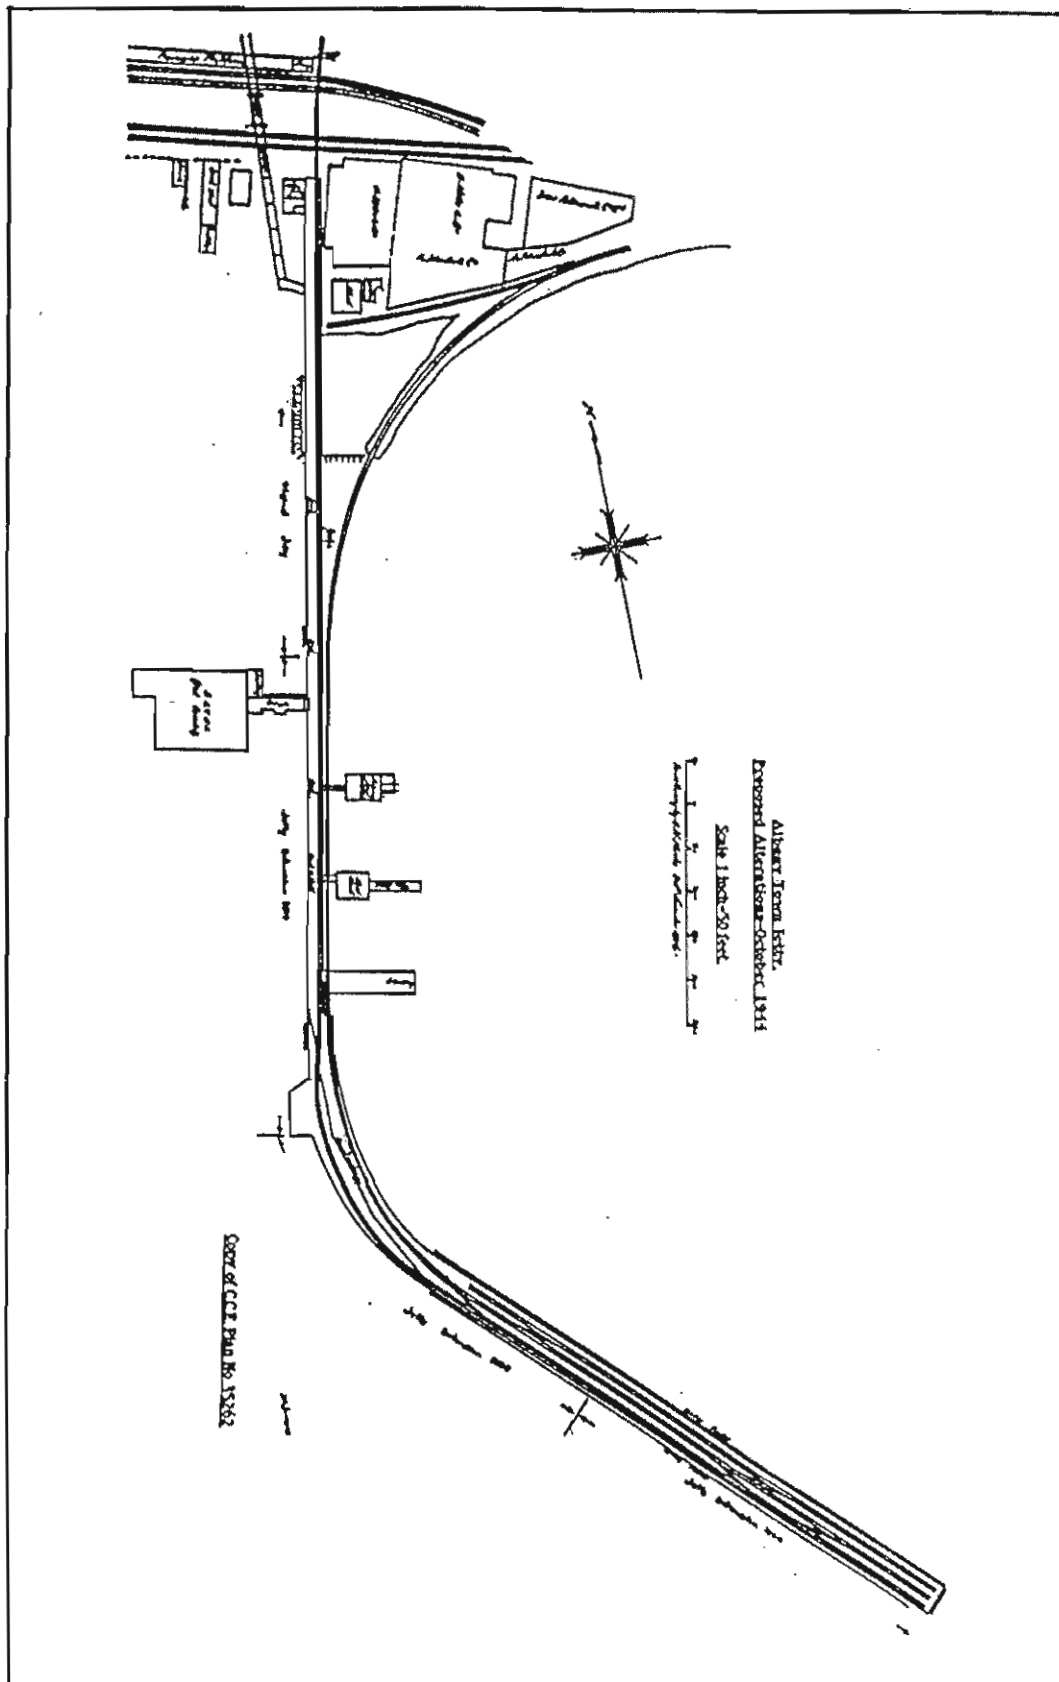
Plan: CCE Plan No. 35262. Albany Town Jetty; proposed alterations. October 1944.
